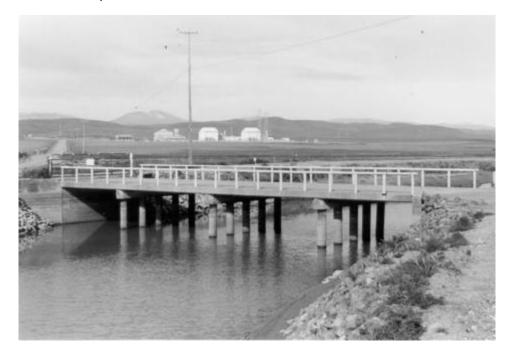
View NW of Canal and Bridge at Dirks Road, 11 March 2001. BRV 2:7. Brian Vahey, photographer.
